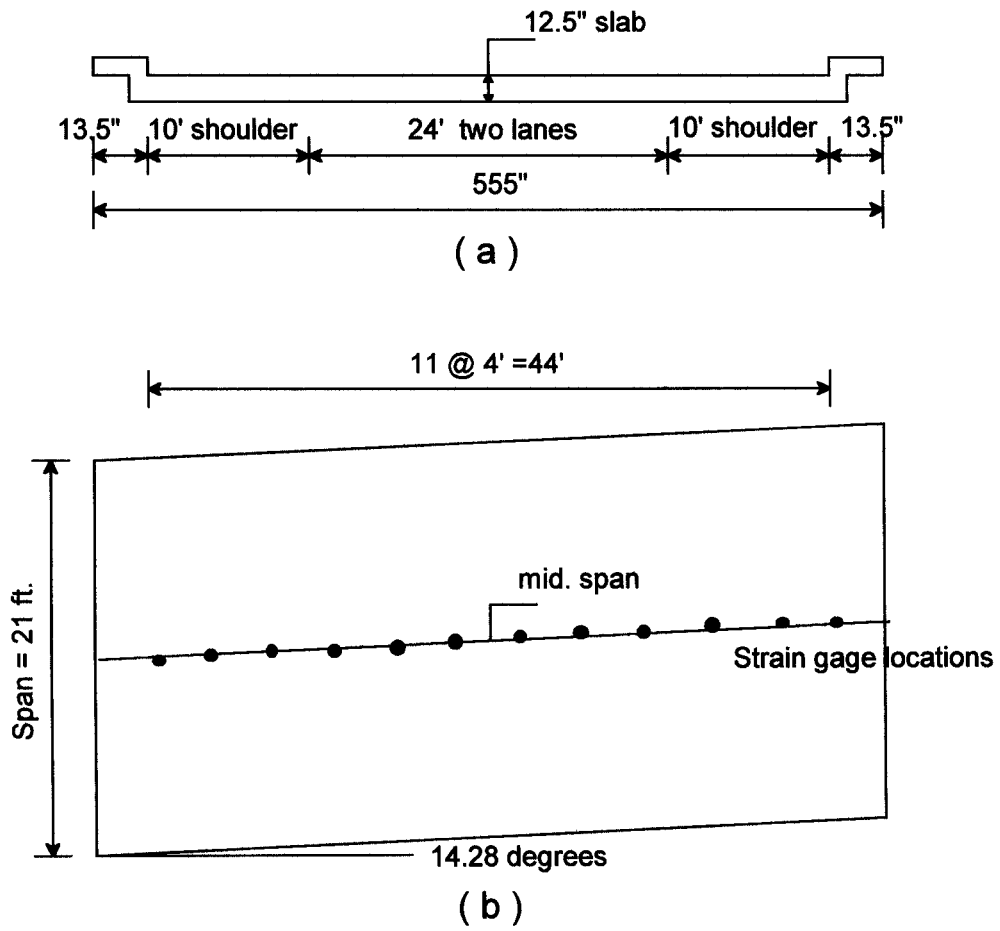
Typical cross-section of solid slab Bridge #030144
